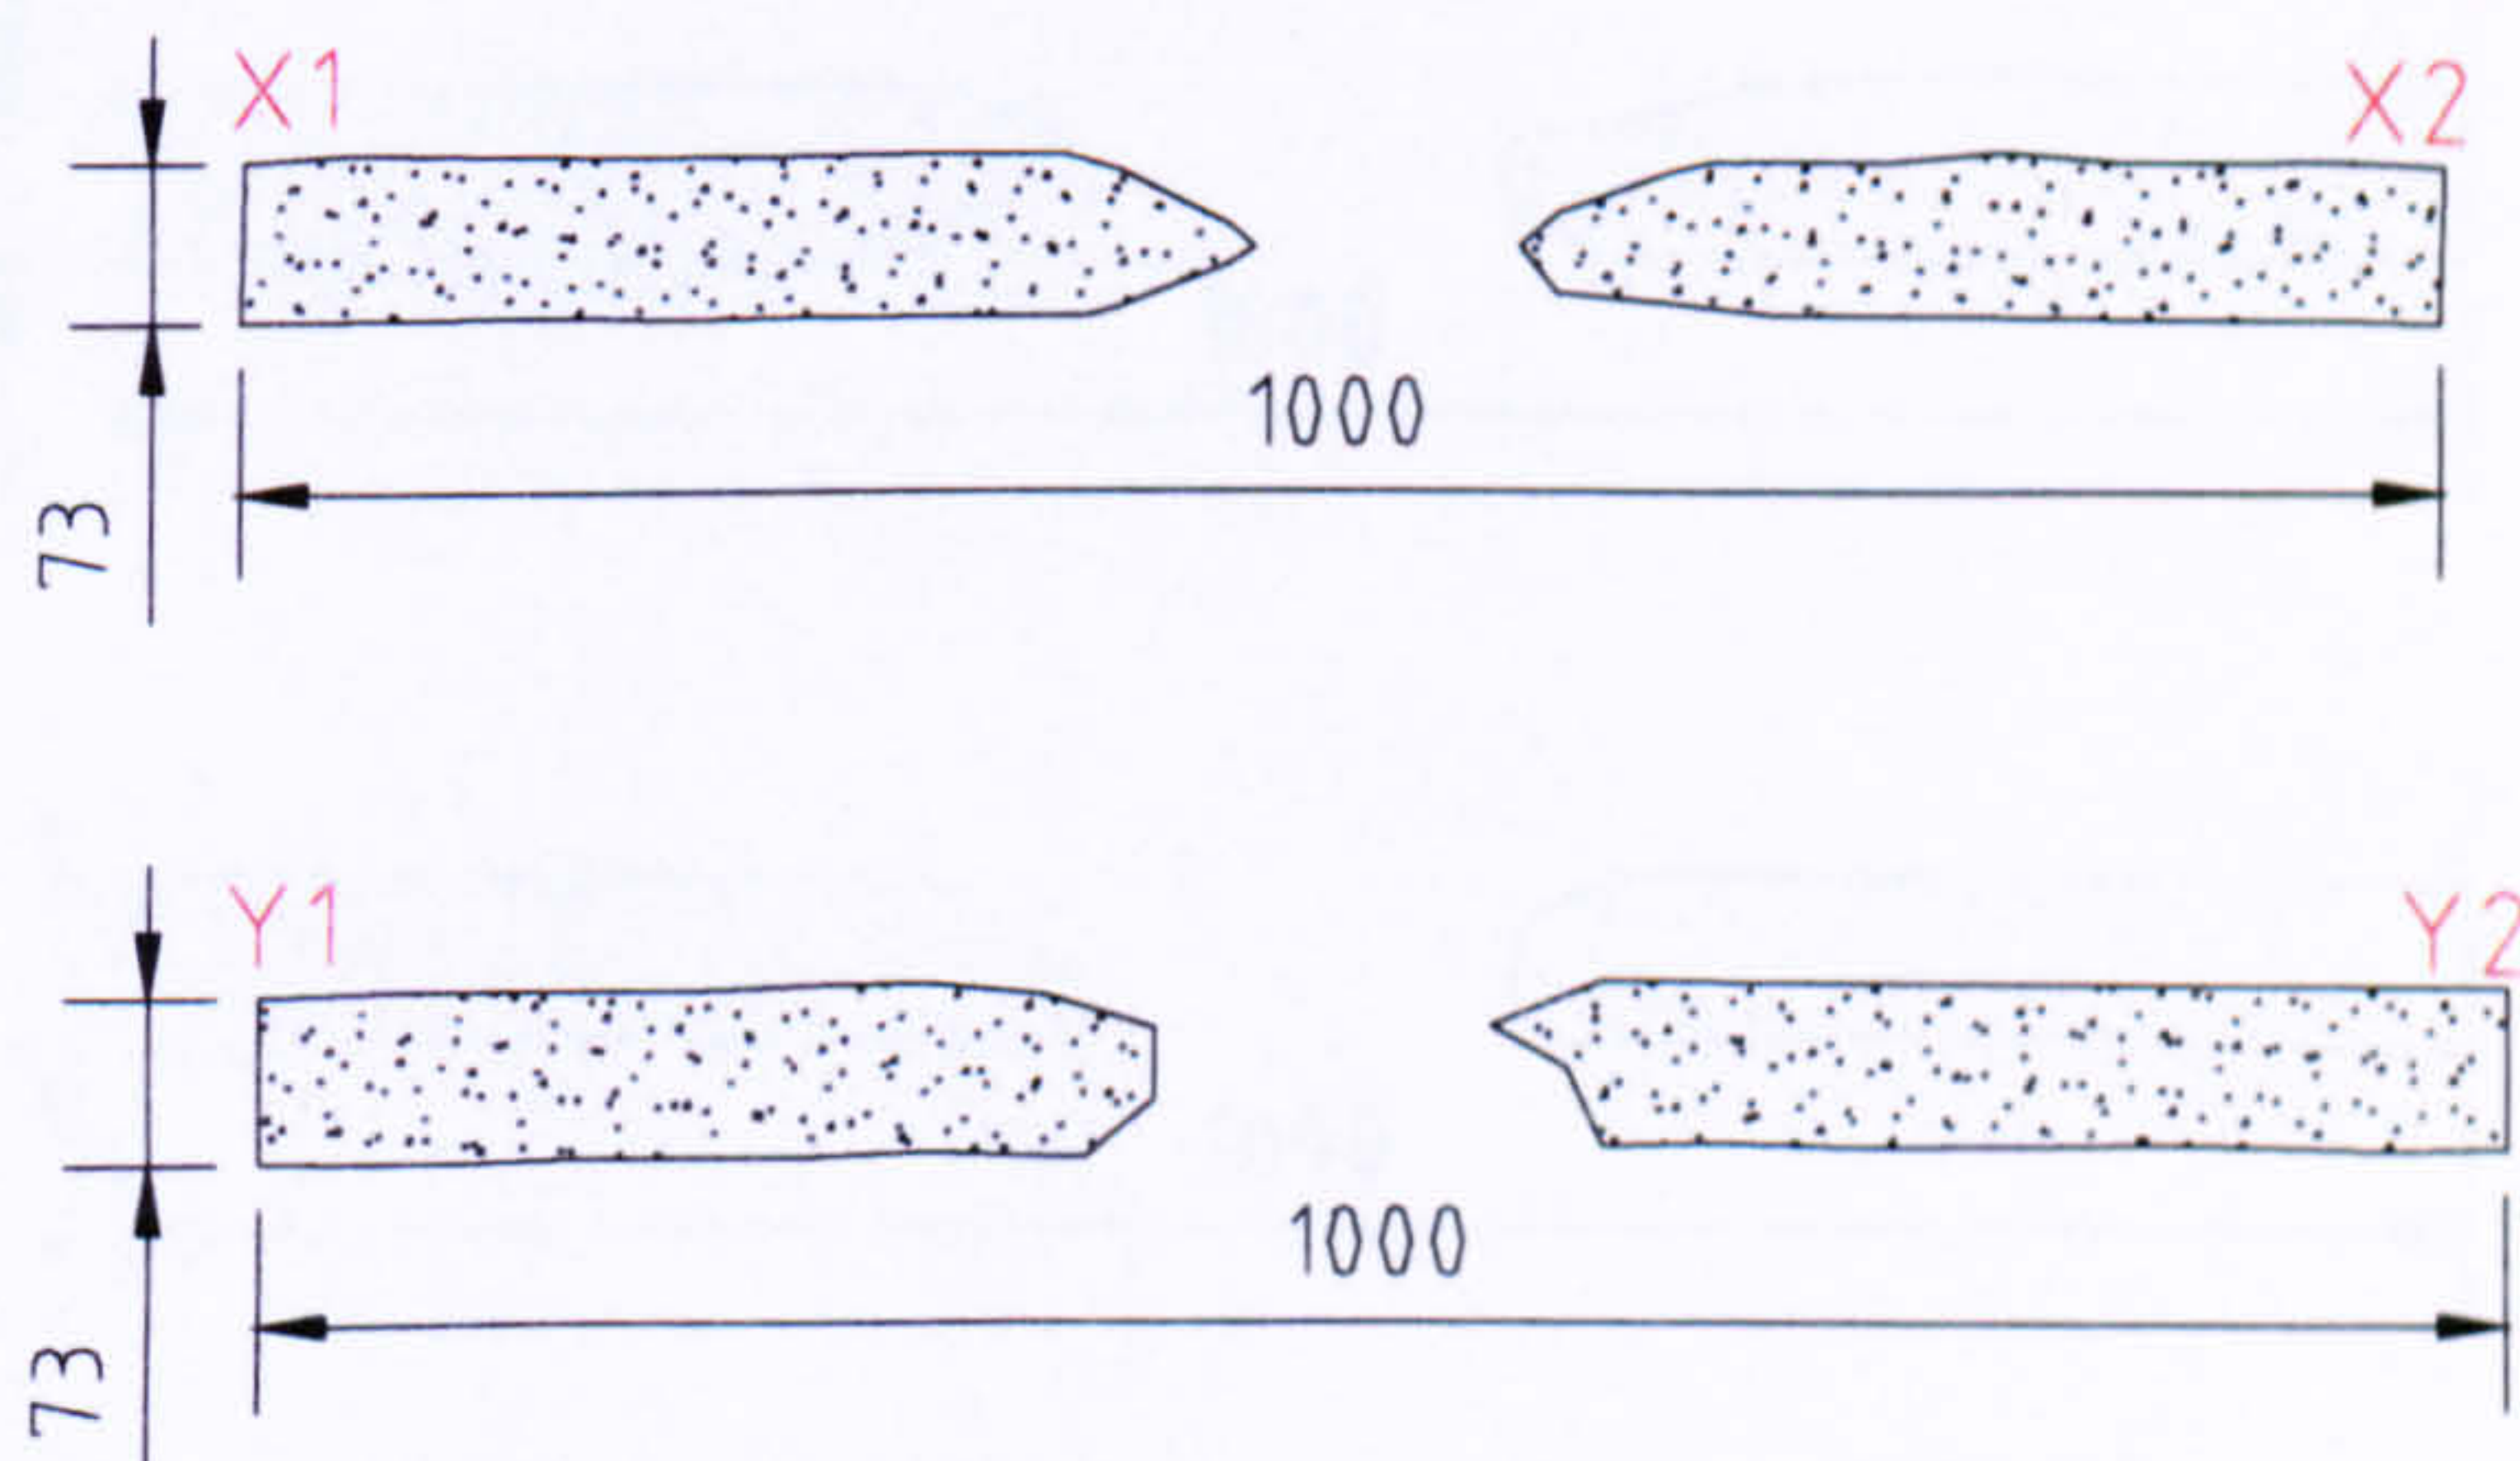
Cross-sectional elevation through X1-X2 and Y1-Y2 of secondary slab RCB73IT15
